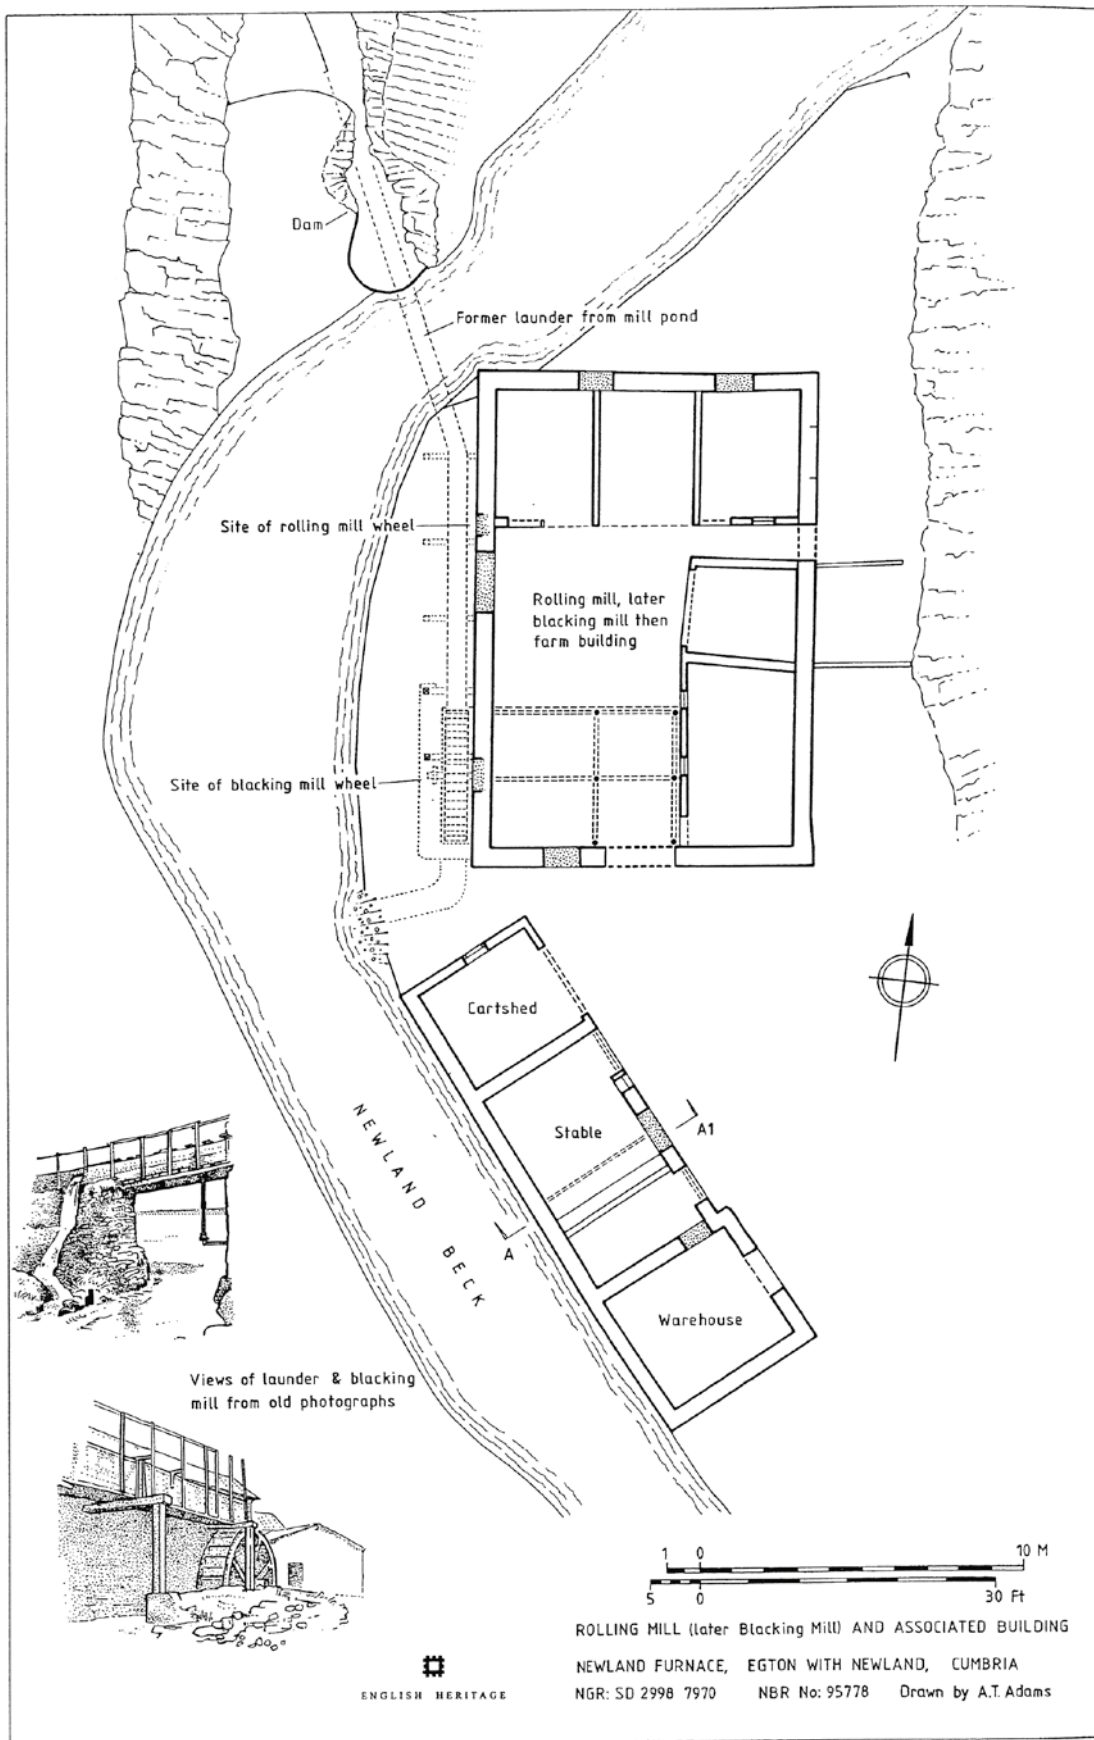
Blacking mill and associated buildings. Ground floor plan and sketches (Goodall 2001, figure 13)
